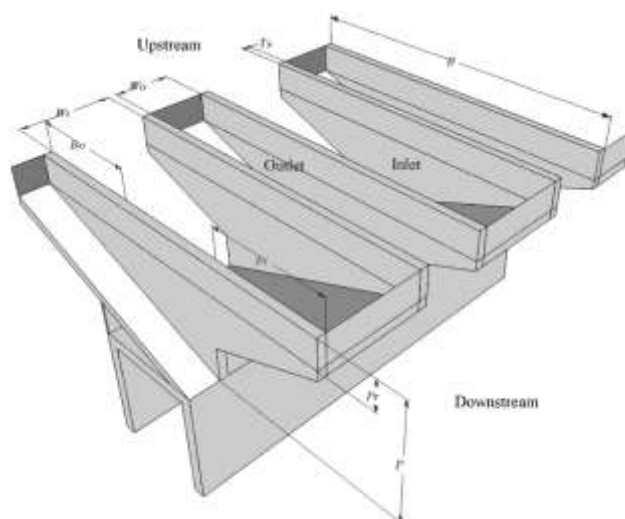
Illustration of a PK Weir with additional parapet walls (Machiels et al. 2012)
